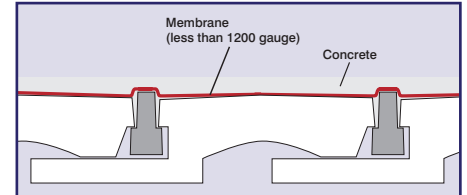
Floor construction using Poly Plus Panel with membrane barrier
